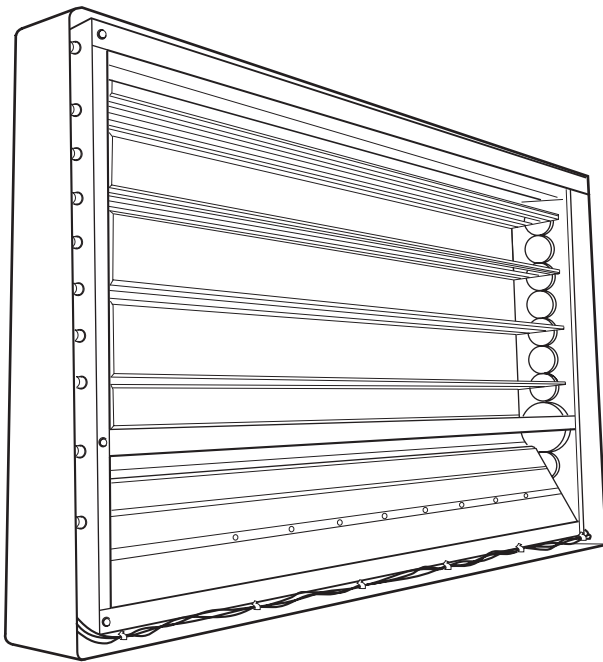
Slide EconoMi\$er Assembly Into Unit
